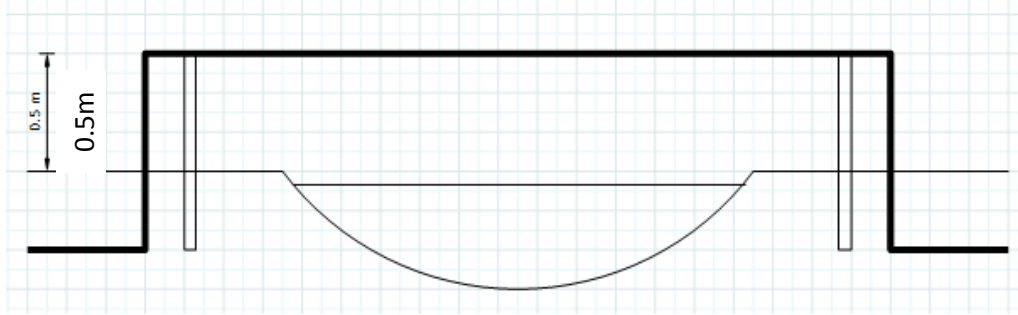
Design 2: Stream Crossings with a Wash Out Risk
